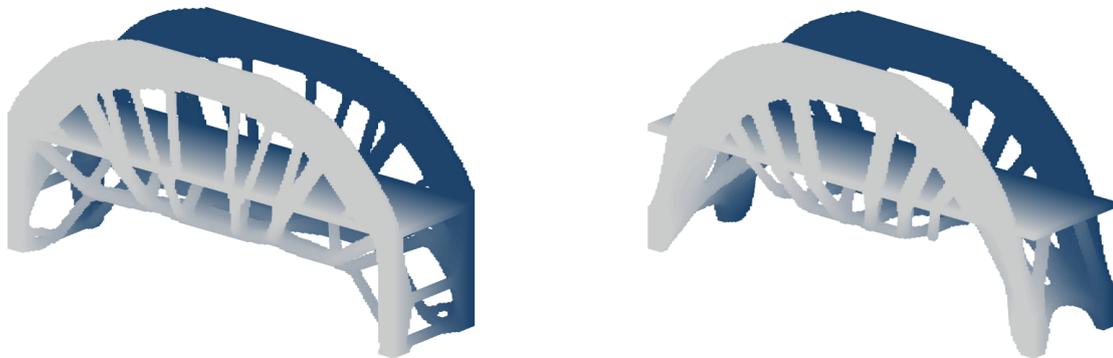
Perspective view of the bridge over a) piles and b) rigid supports.
